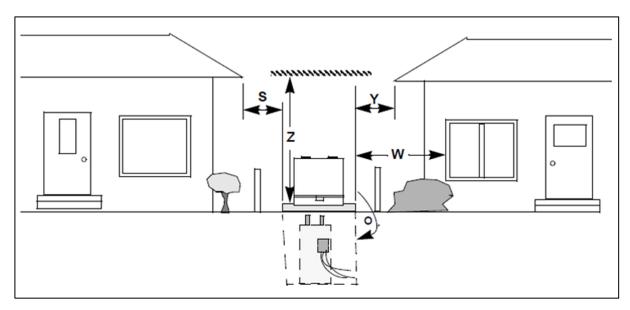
Minimum Separation of Non-Reduced Clearance Transformer
